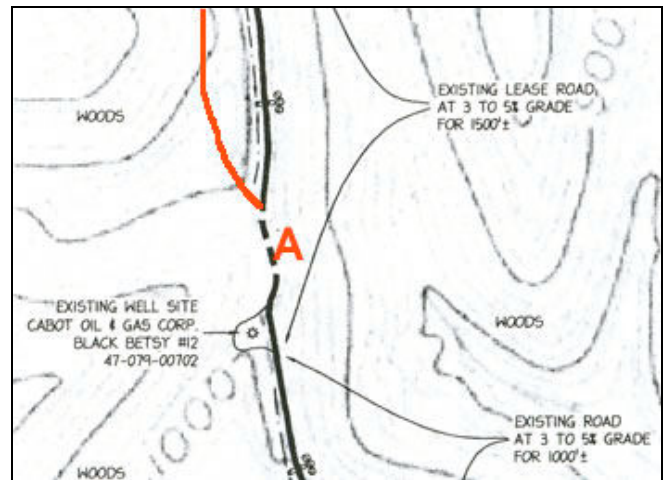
Part of permit application drawing for 47-079-01283, the access road constructed for 47-079-01314. The hatched road section is the location of the water filled ruts in photo 1. The red road segment on the drawing is the actual access road with a steep grade north of 47-079-00702. The route shown on the drawing is a pipeline right of way and is not always open for road access because of fallen trees or deep holes.
